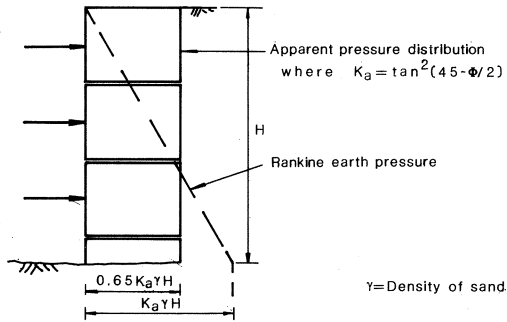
Apparent Pressure Distribution for Completed Excavation in Sand for Computing Strut Loads (PECK, 1969).
